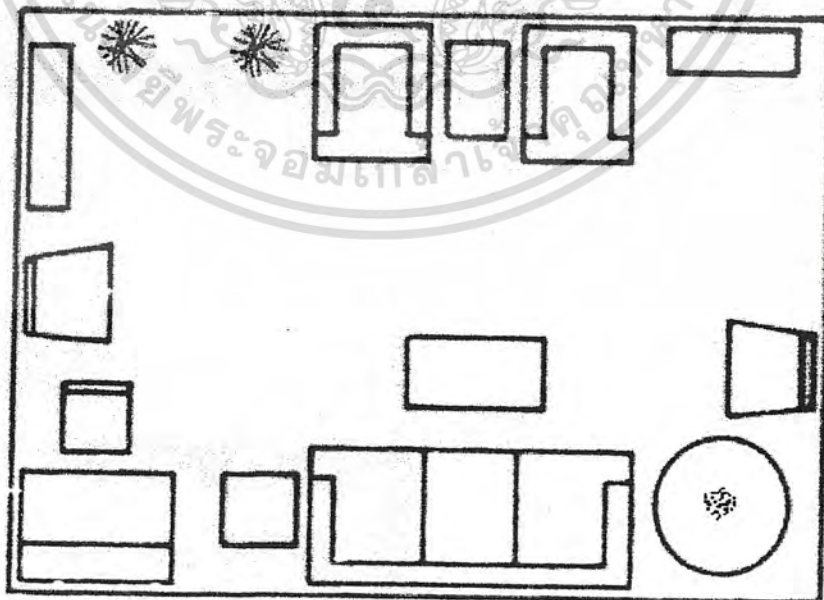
Typical furniture arrangement for a three-bedroom apartment (12.5 ft x 20 ft, 250 ft²).
